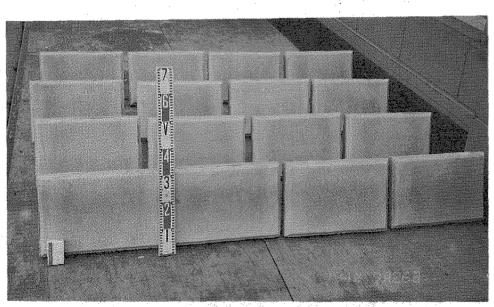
The surface mortar layer on concrete blocks for retaing wall and revetment, laying blocks containing FRP fine powder.
